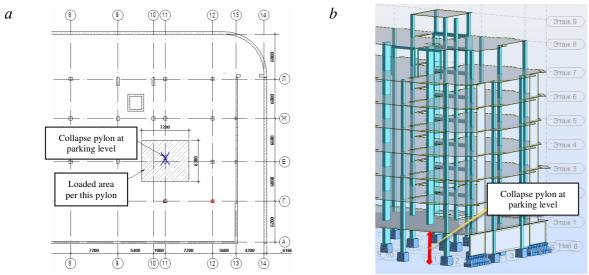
Calculation scheme of emergency situation №1 – middle pylon 11E collapse at parking level: a – calculation scheme layout; b – finite-element scheme
